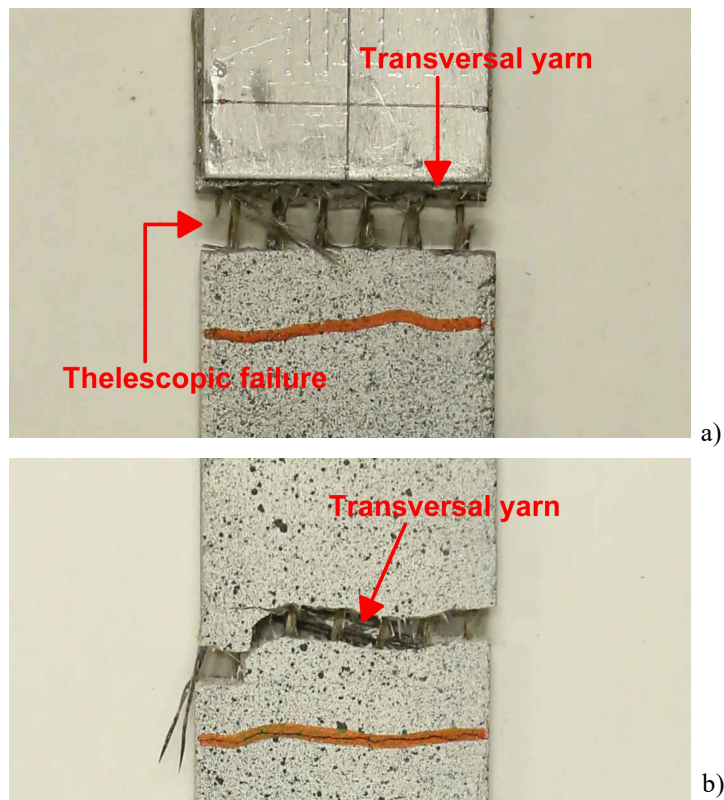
Failure mode of BFRCM specimens: a) telescopic failure of textile longitudinal yarns and crack at the transversal yarn b) critical crack at the transversal yarn
